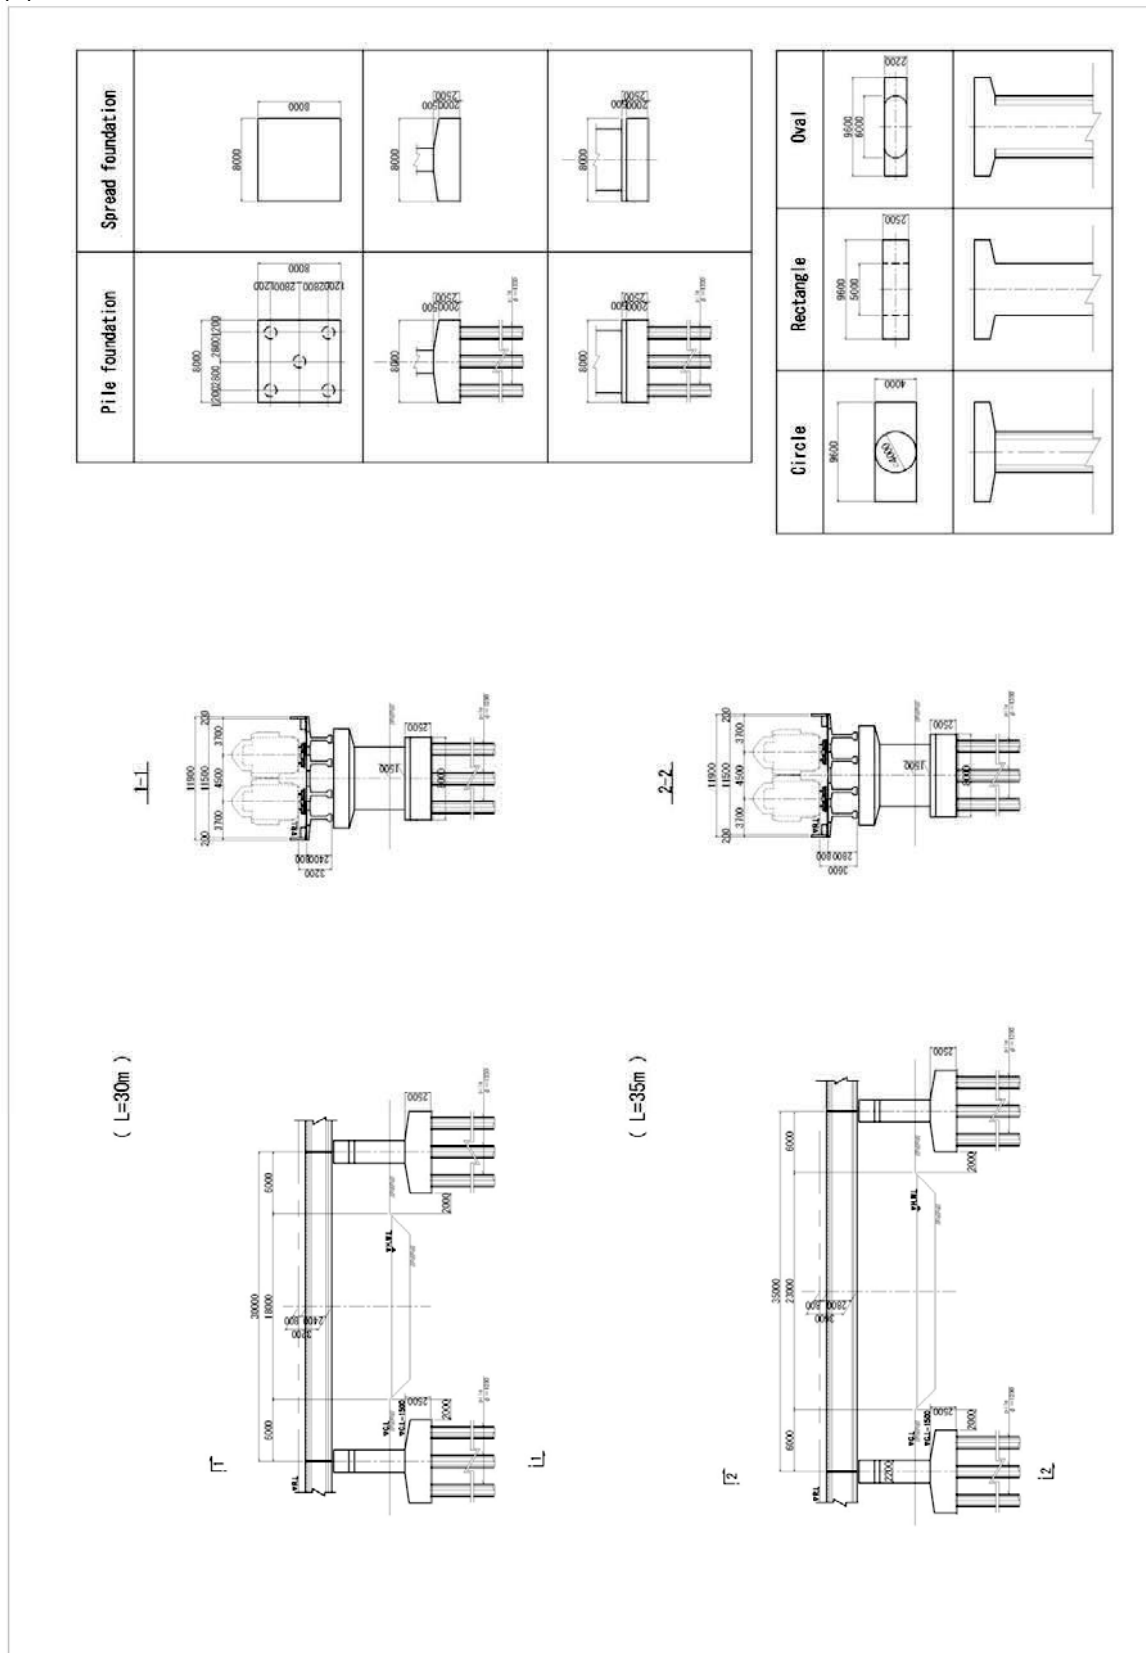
Drawing of Standard Structure Type for Bridge, Simple-girder, 1-span(1)
